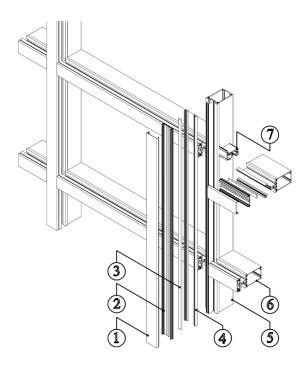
Stick curtain wall components. 1. Snap cap, 2. Pressure plate, 3. Thermal break, 4. Gasket, 5. Vertical mullion, 6. Horizontal mullion, 7. Shear block. Adapted from Kawneer 1600 Wall System 1, Kawneer Inc. (2014).
